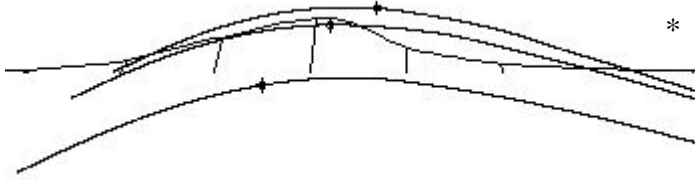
Midwest Guardrail System as Tested. ⁽⁷⁾
